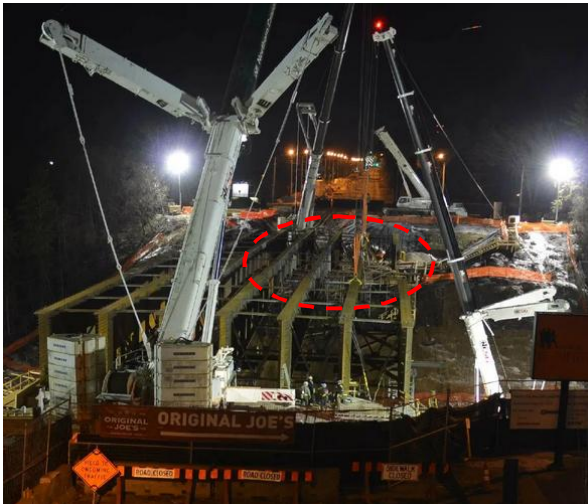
Aerial view of the beams under a failed position (<https://edmonton.ctvnews.ca/damaged-girders-on-102-ave-bridge-repaired-to-be-reinstalled-1.2375088>).
